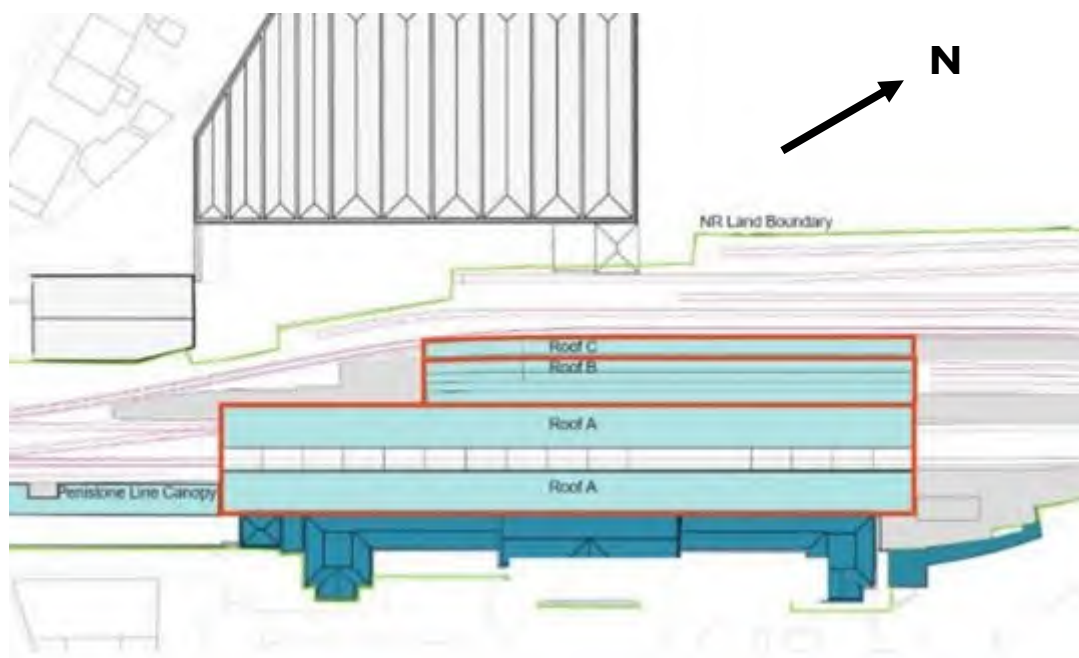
Plan view of Roofs A, B and C (Appendix A)
